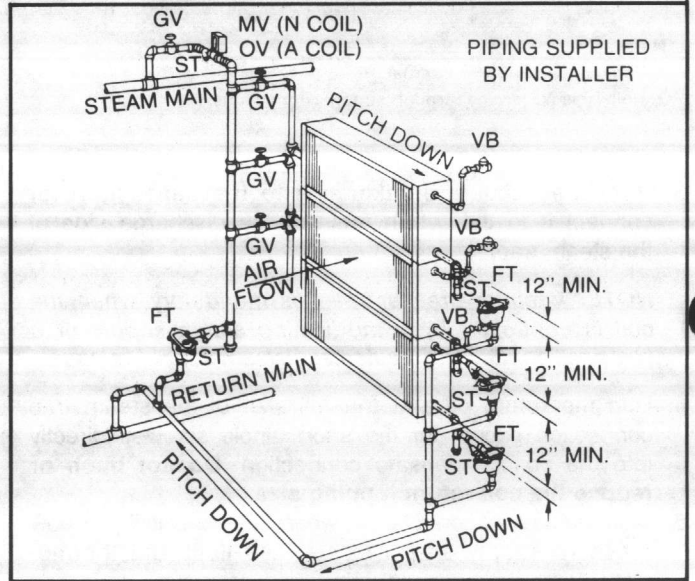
Typical Piping for Type A or N Steam Coils, Horizontal Tubes for Horizontal Airflow
